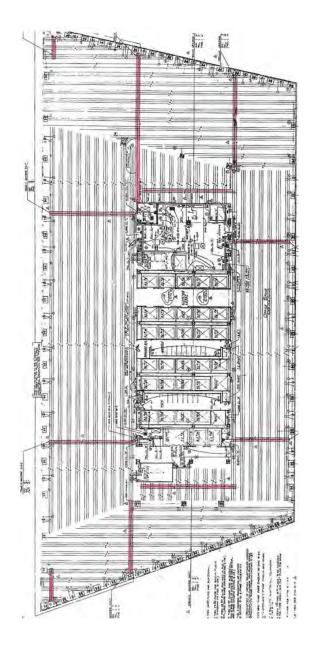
Location of trench header ducts (ie concrete slab discontinuities) on typical floors of WTC7 shown in red (PANYNJ0102202)
